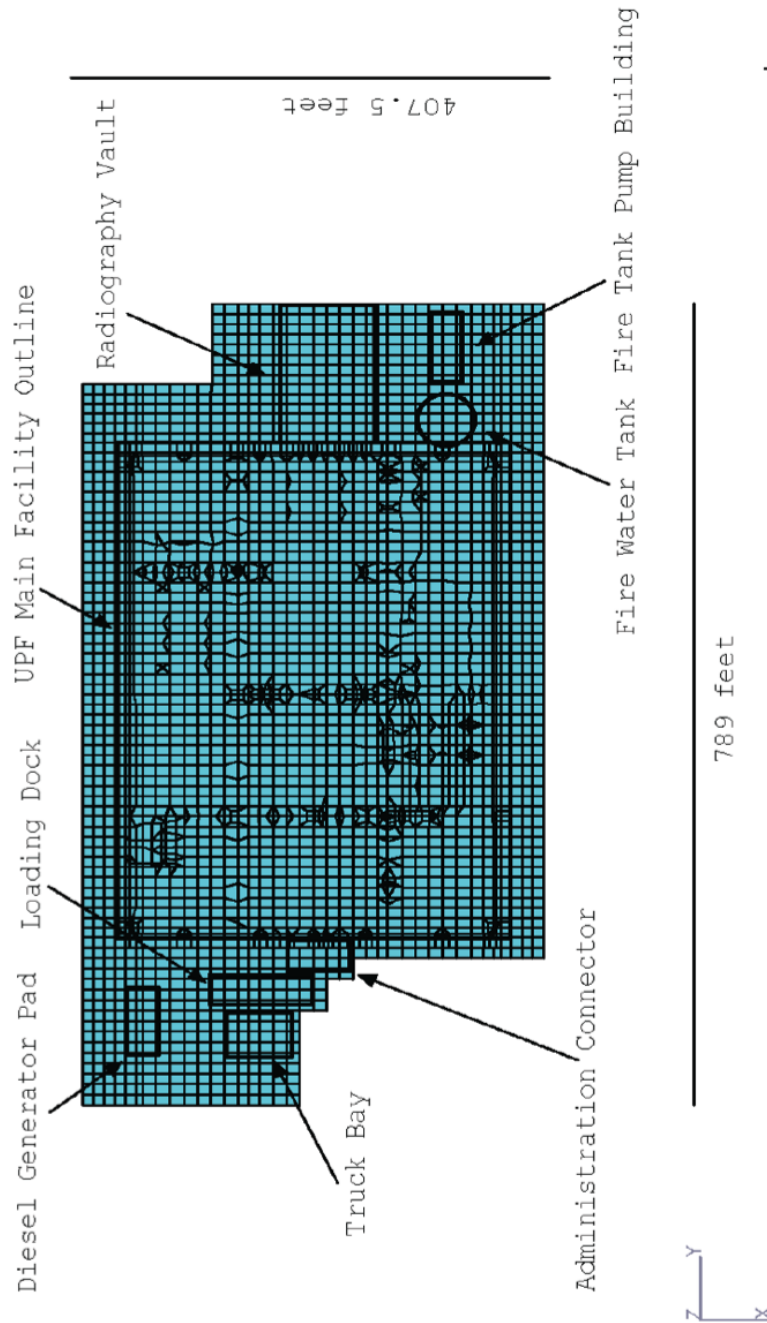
Extent of Mass-Fill Concrete and Building Locations
